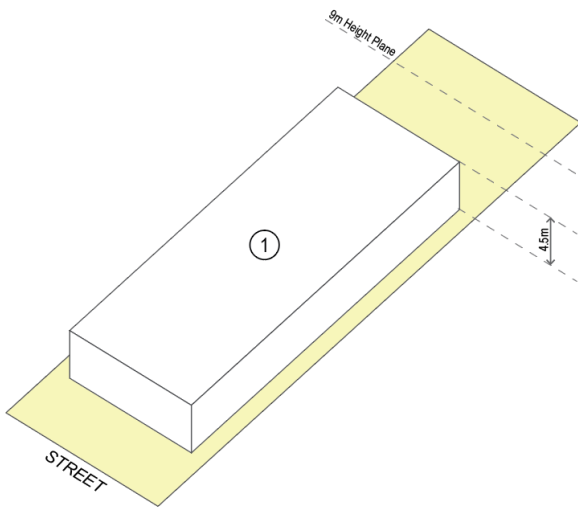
Massing of single storey dwelling house on a 700sqm site (FSPA)
